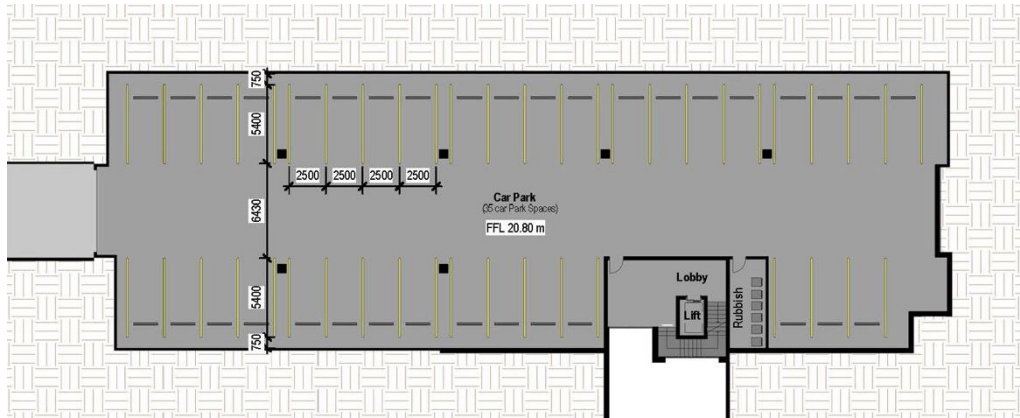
The Level 1 (basement) floor plan of Building B04 (Ryman Drawing A1-010 RC22).
